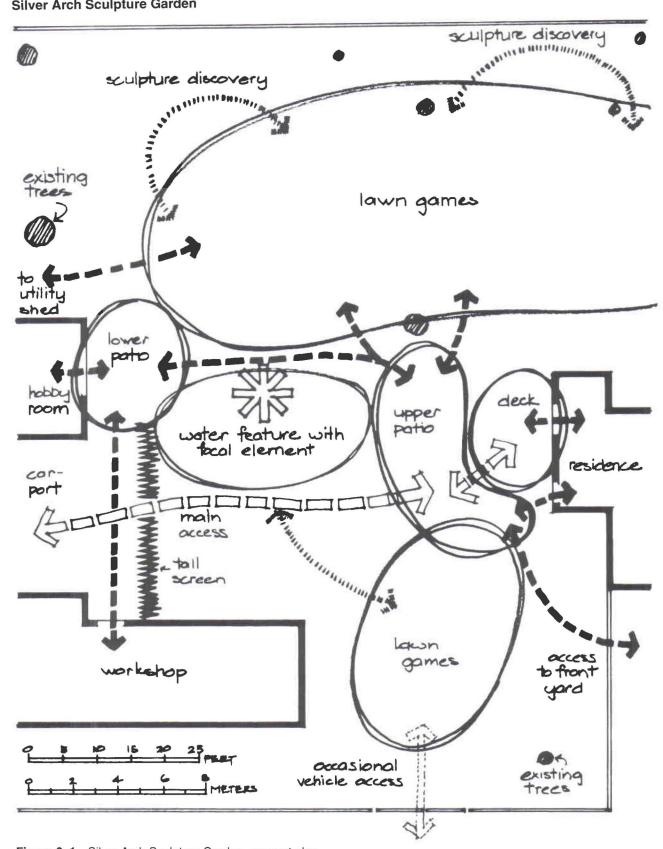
Silver Arch Sculpture Garden, concept plan
